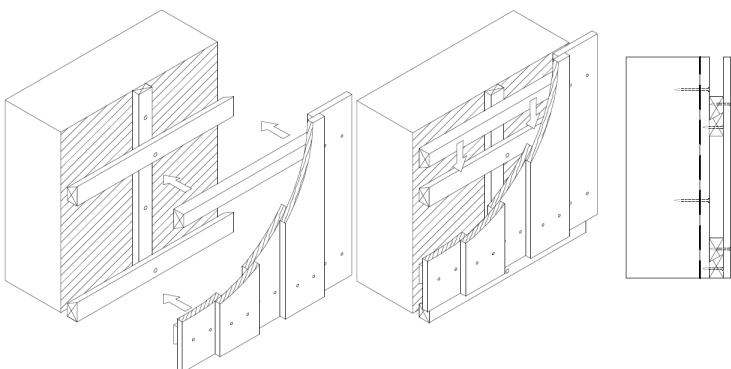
Vertical external timber cladding panel with horizontal battens with a 45deg cut
